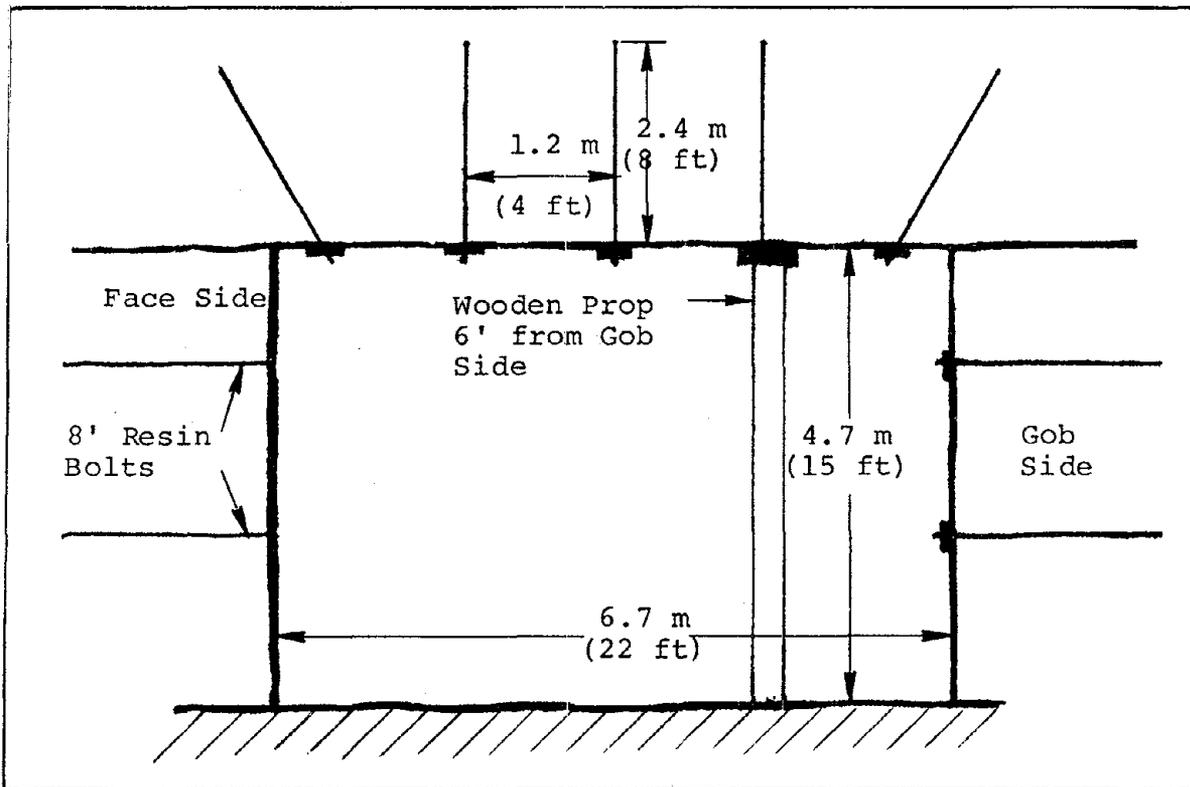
Installation Area Developed at a 22 ft. Minimum Width and a 15 ft. Height. Face bolting can vary depending on strength of coal and tendency to spall.
